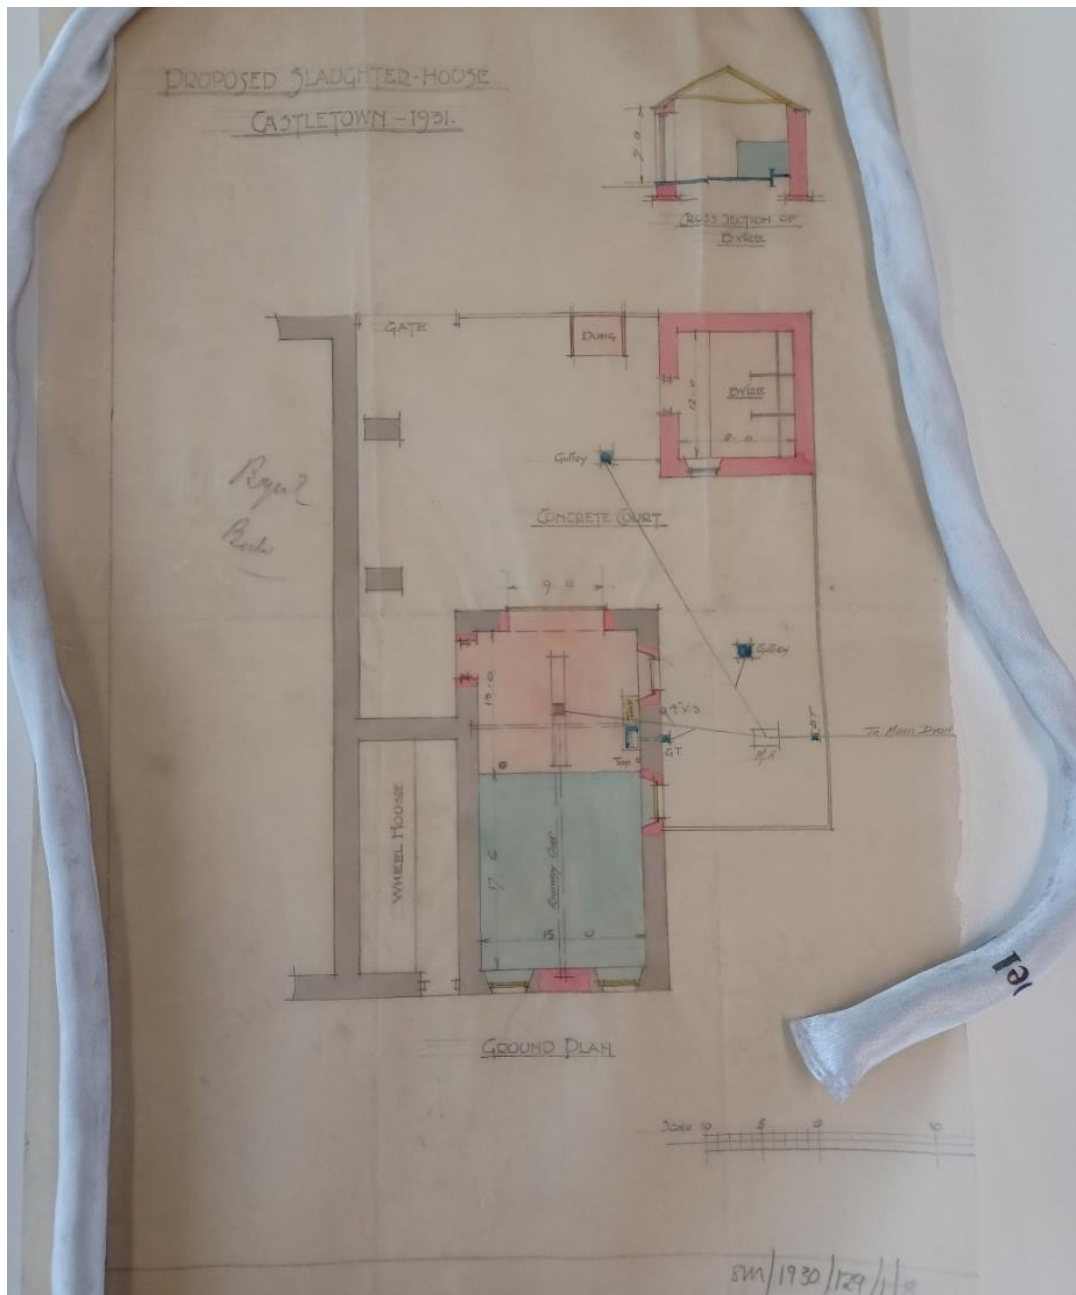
Plan from 1930 for “Proposed slaughterhouse Castletown” (North Highland Archive ref: C/SM/1930/129).
